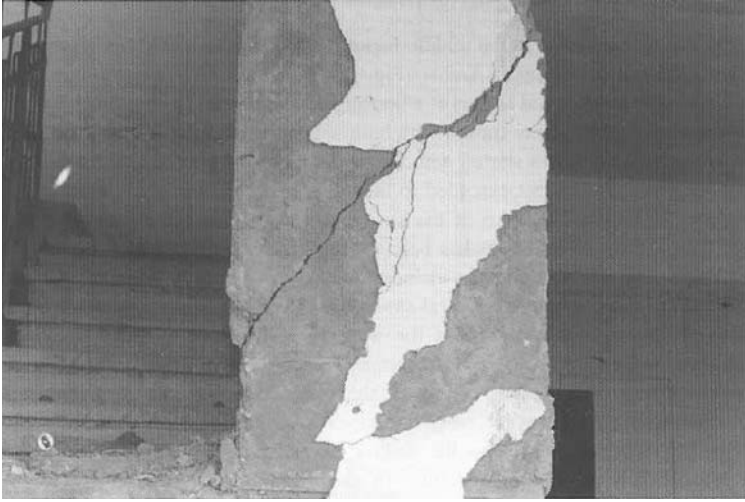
Cracks in a reinforced concrete column.
